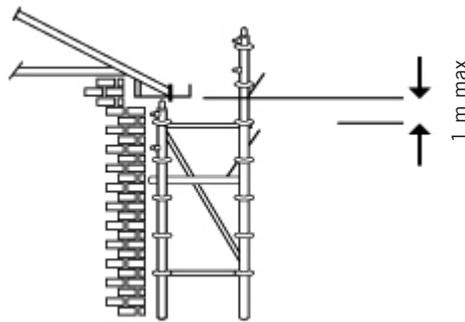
Scaffold as roof-edge protection (end guardrail omitted for clarity)
